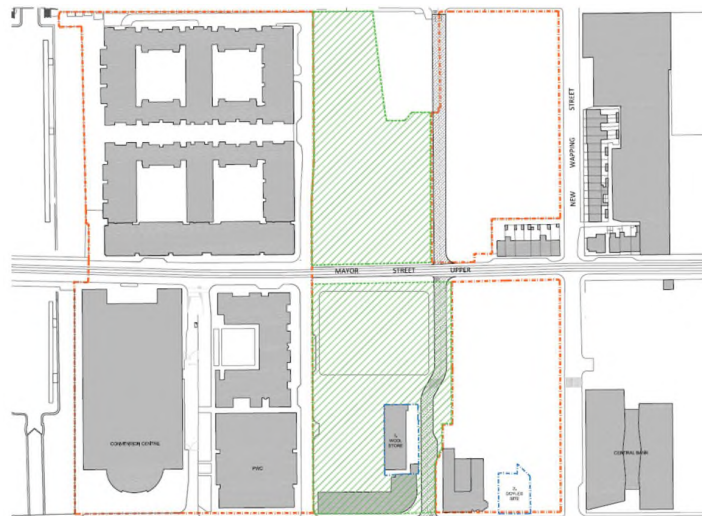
Option B site location and volumetric view of the buildings planned for the site in the North Lotts & Grand Canal Dock Planning Scheme
